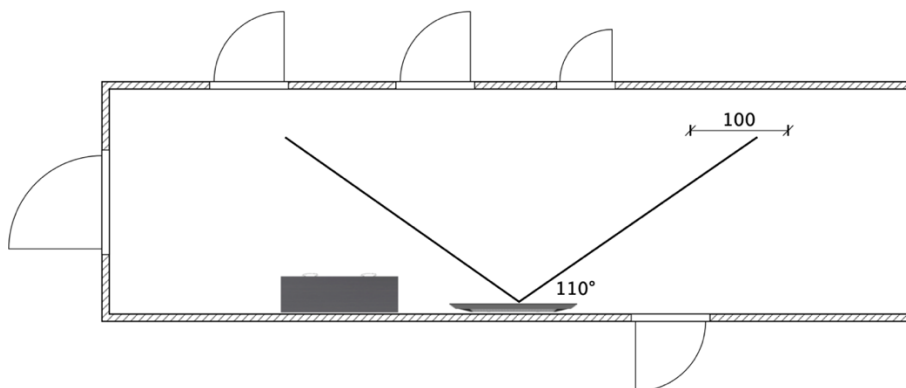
Building 41, second floor – a smaller corridor heading to offices and seminar room of one of the working groups in the Informatics department
